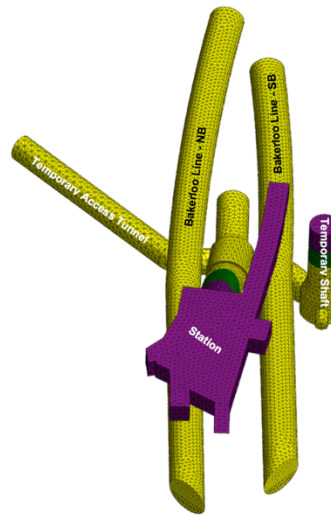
3D Finite Element Model of existing station and tunnels with new shaft and SCL tunnels.
